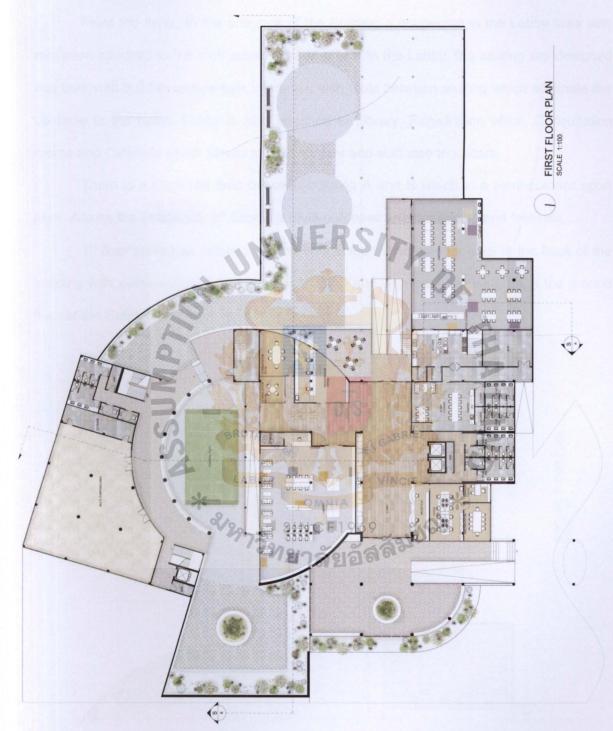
FIRST FLOOR FURNITURE LAYOUT PLAN
